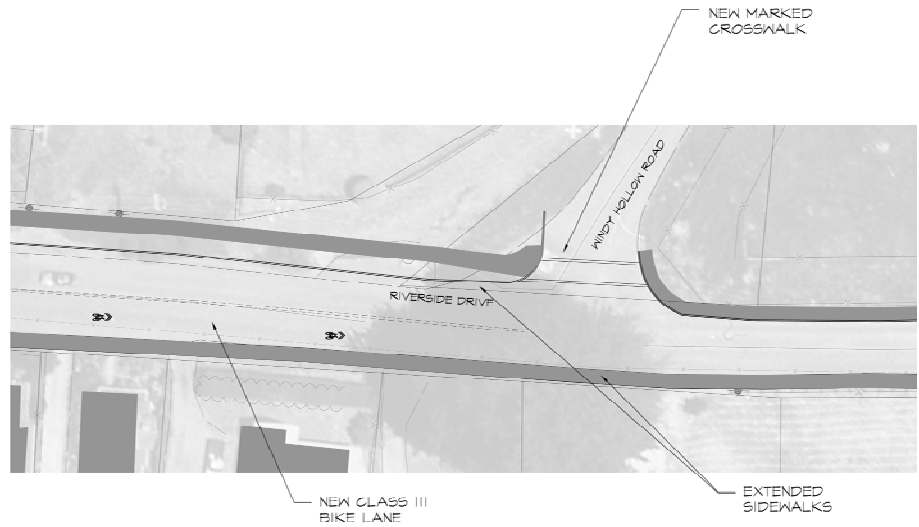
Basic Recommendation at Windy Hollow Road/Riverside Drive /Eureka Hill Road Intersection
